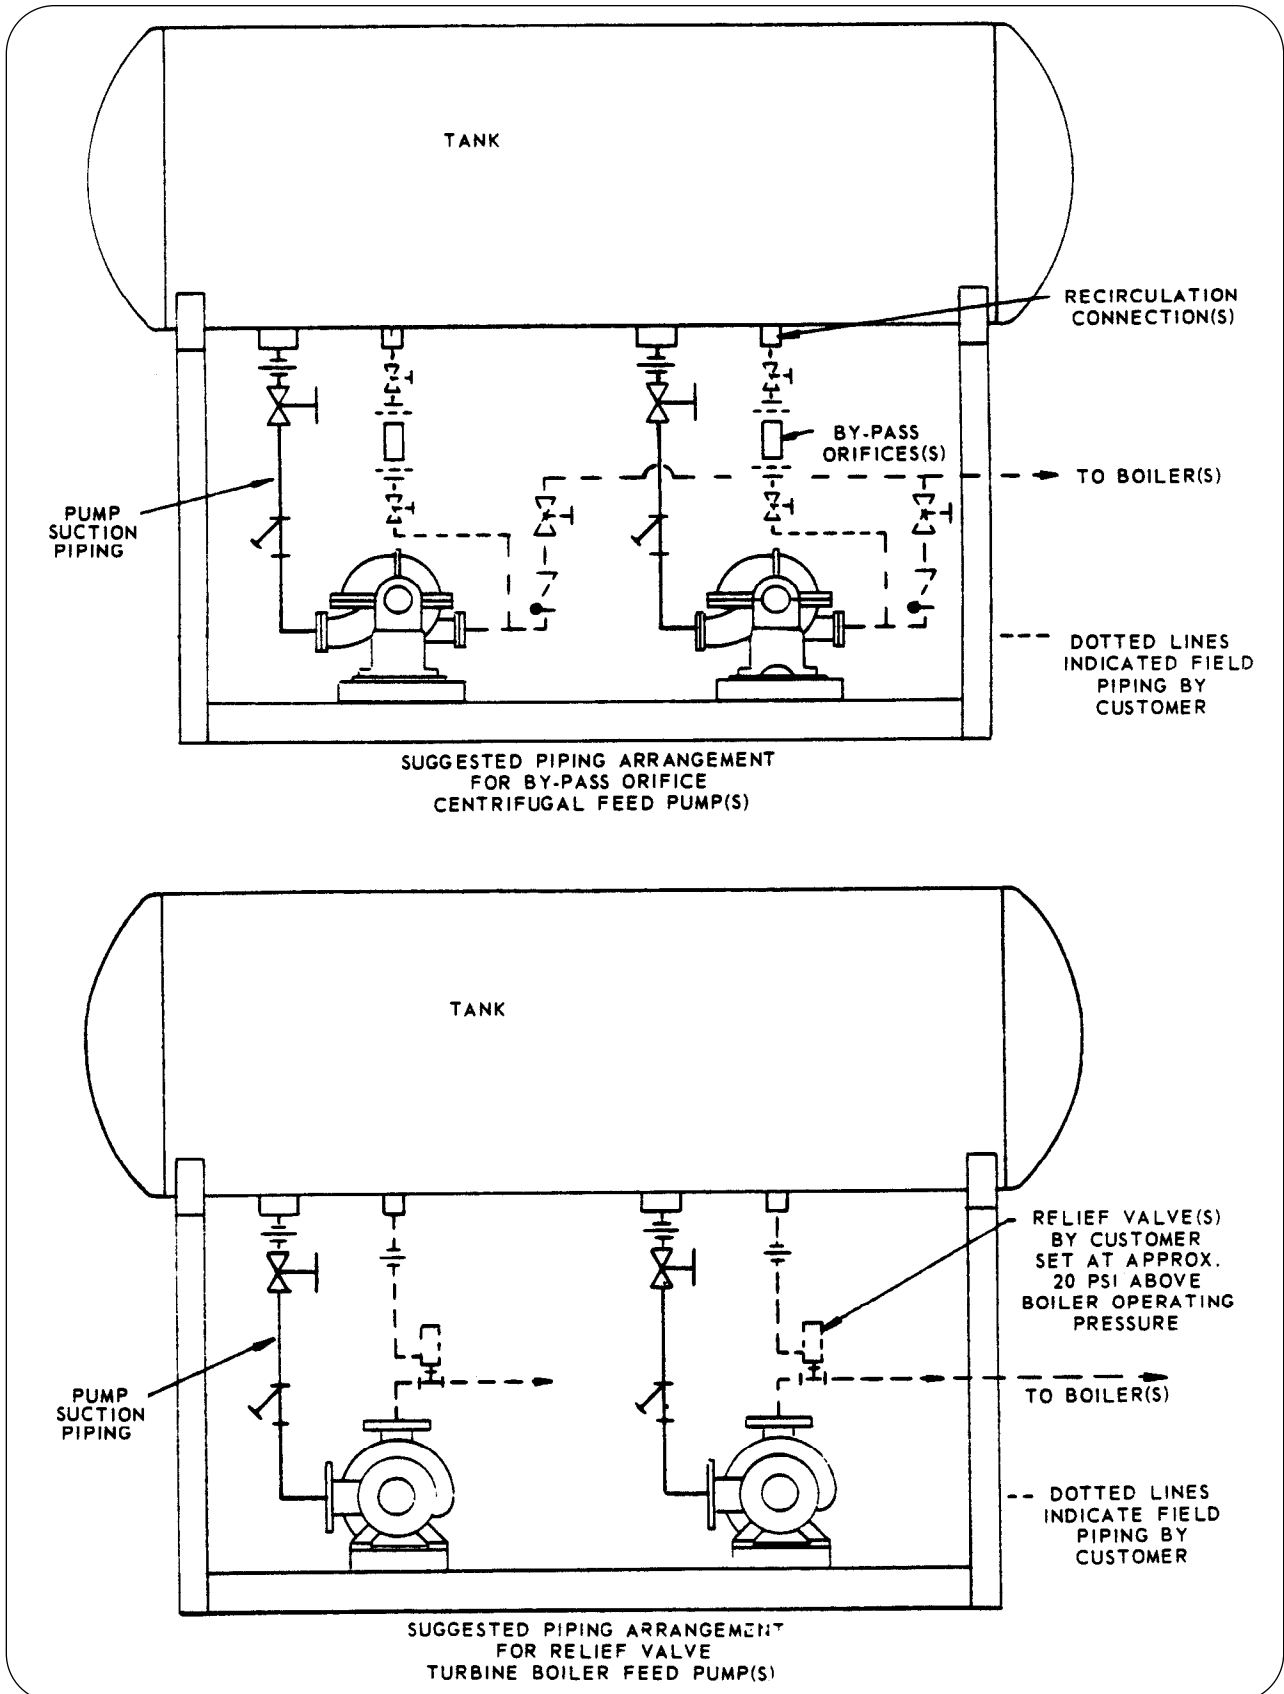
Suggested Piping Arrangement for Boiler Feed Pump
